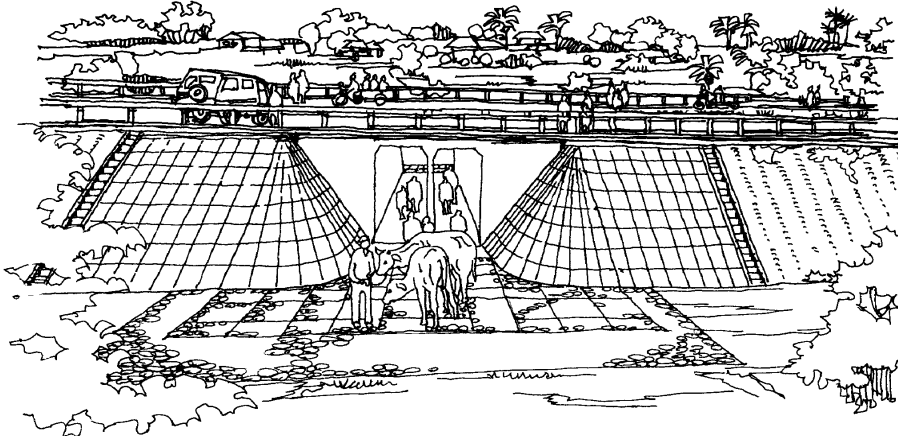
Image of Box Culvert Used as Crossing Facility
